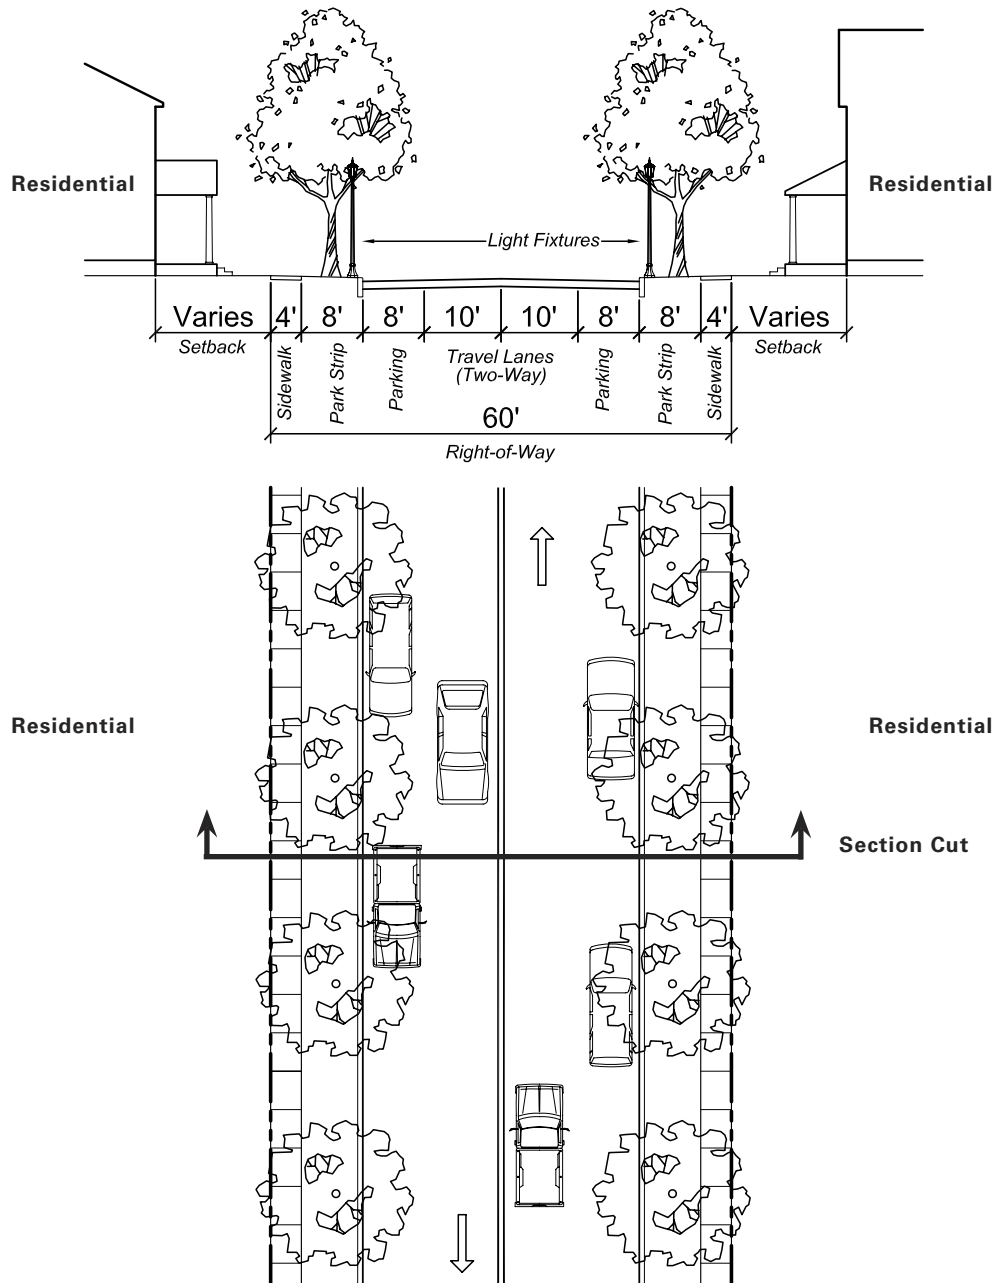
Proposed Section and Plan: Neighborhood Street A
